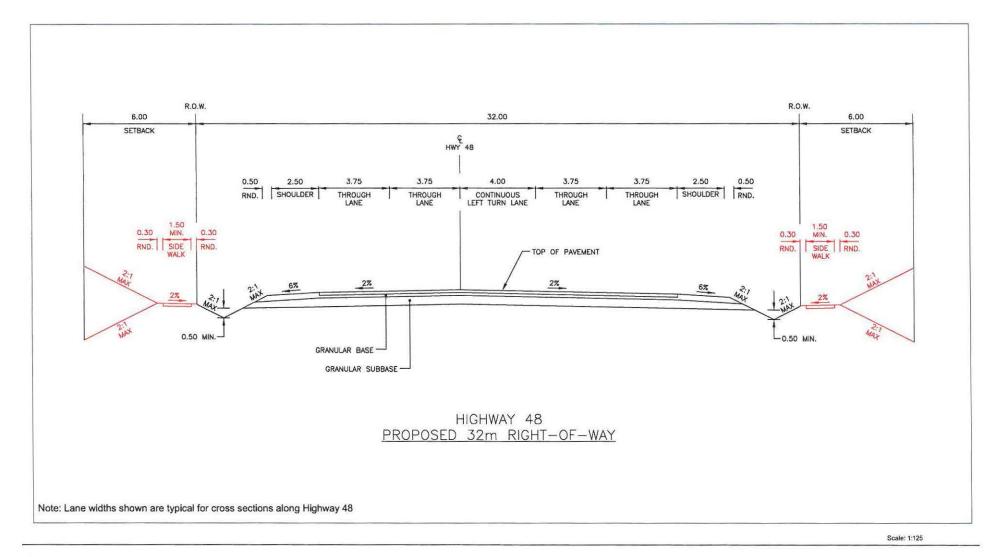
Highway 48 typical 32.0m Right-of-way Cross-Section Ballantrae-Musselman Lake and Environs Secondary Plan Review
